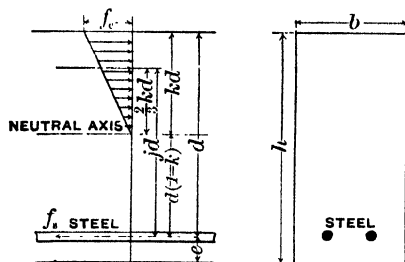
Resisting Forces in a Reinforced Concrete Beam. (See p. 482)
